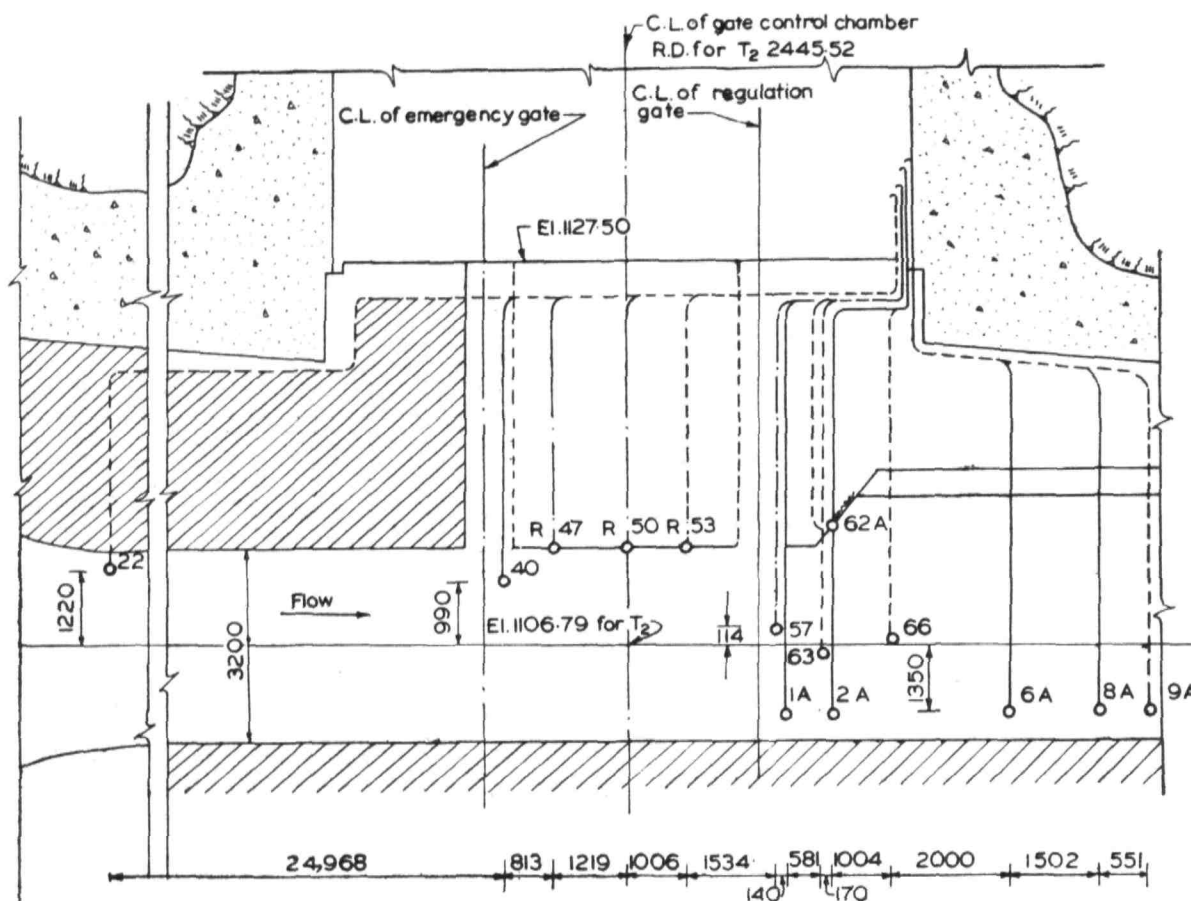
Section through centre line left conduit T₂ tunnel location of piezometers.
